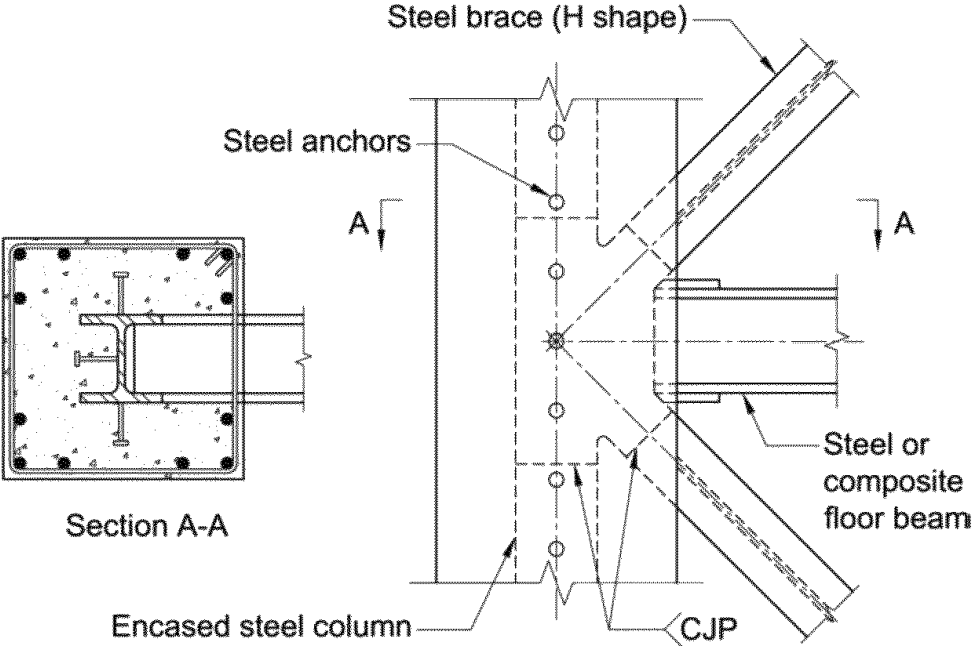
Reinforced concrete (or composite) column-to-steel concentric brace.
